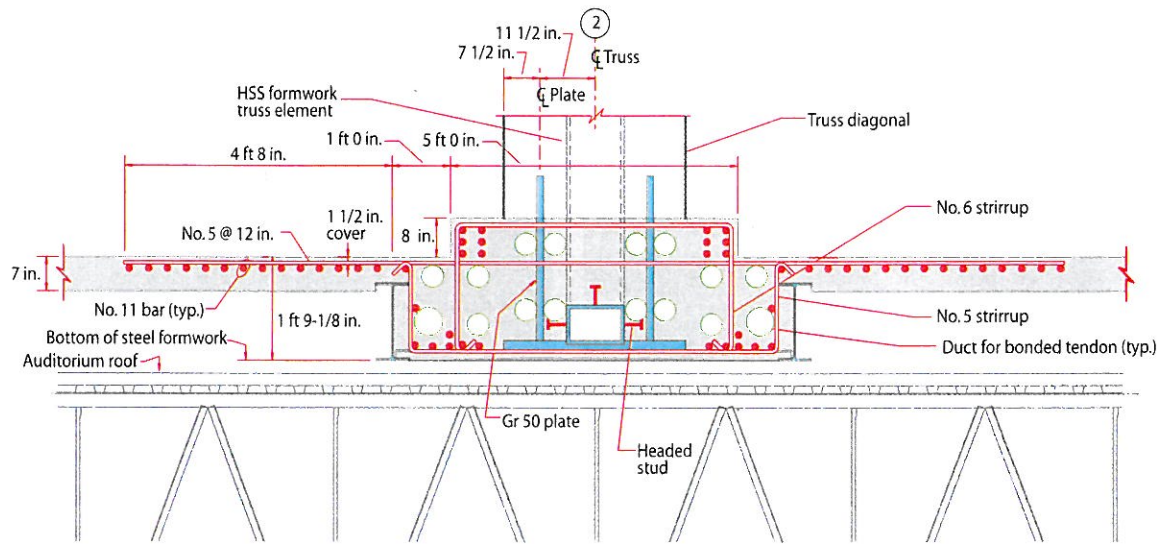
Section through the bottom chord of a truss at the location of a cheek plate. The HSS sections in the support truss are also shown (1 in. = 25.4 mm)
